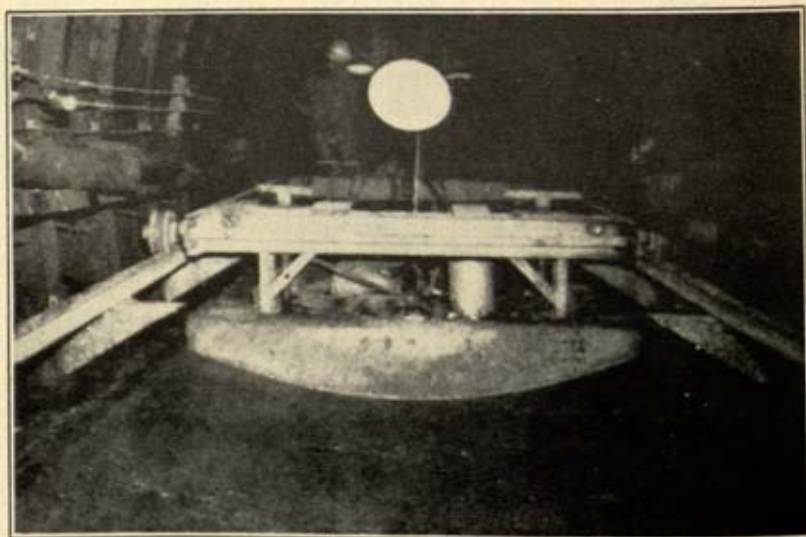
Steel screed used to line the invert of a tunnel. (*Chicago Bridge & Iron Co.*)
